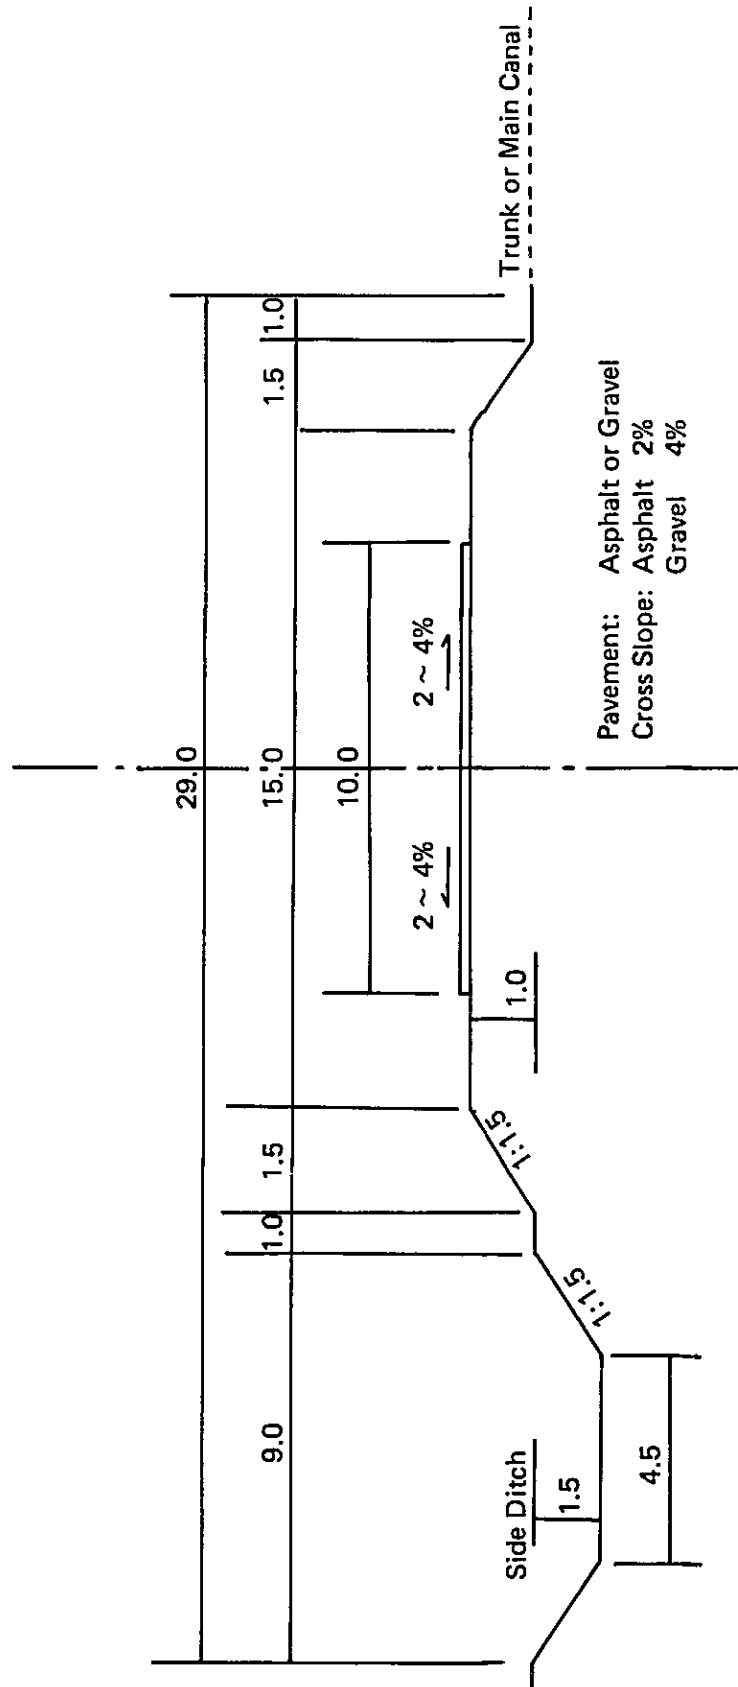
Trunk Road Standard Section (Unit: m)
